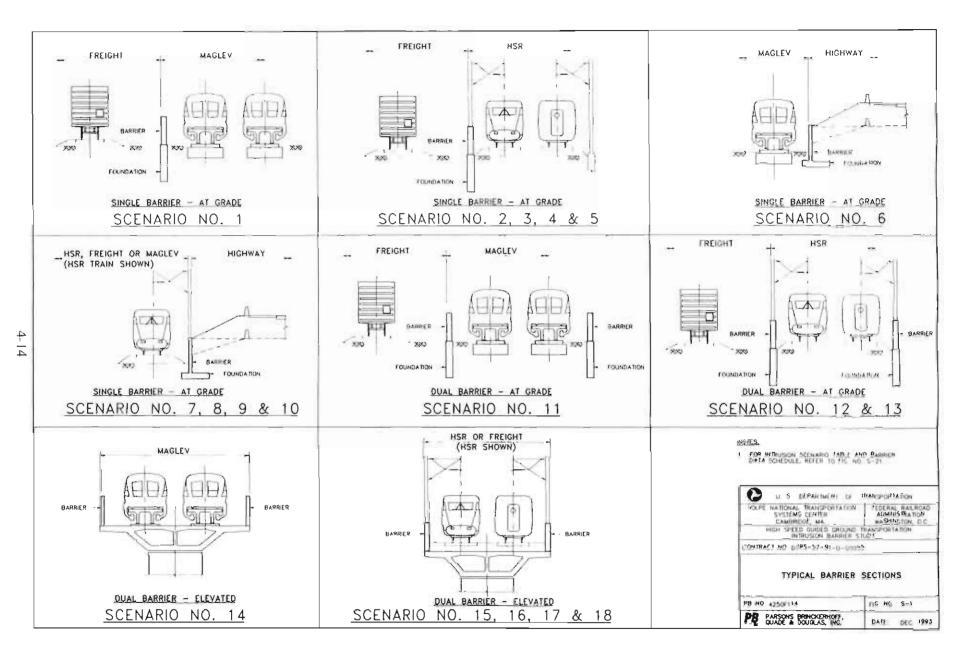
TYPICAL BARRIER SECTIONS
